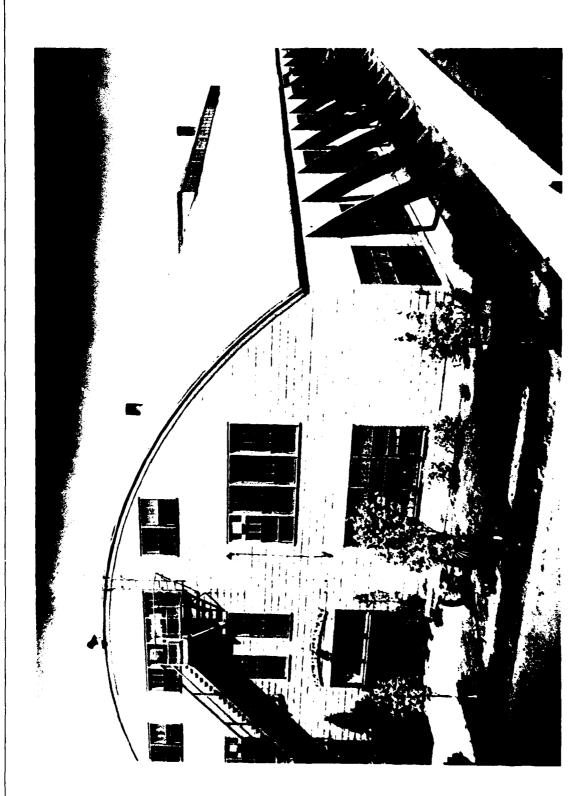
Laminated Arch Navai Drill Hail by Shreve, Lamb, and Harmon, 1943. (Source: Great Lakes Public Works Department.)
